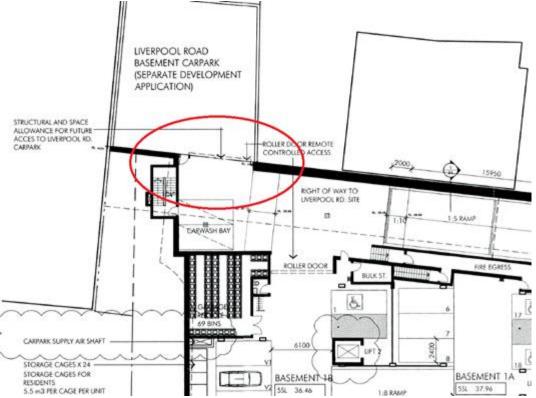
Approved basement plan of No. 1-7 showing opening to future basement level of subject site.
